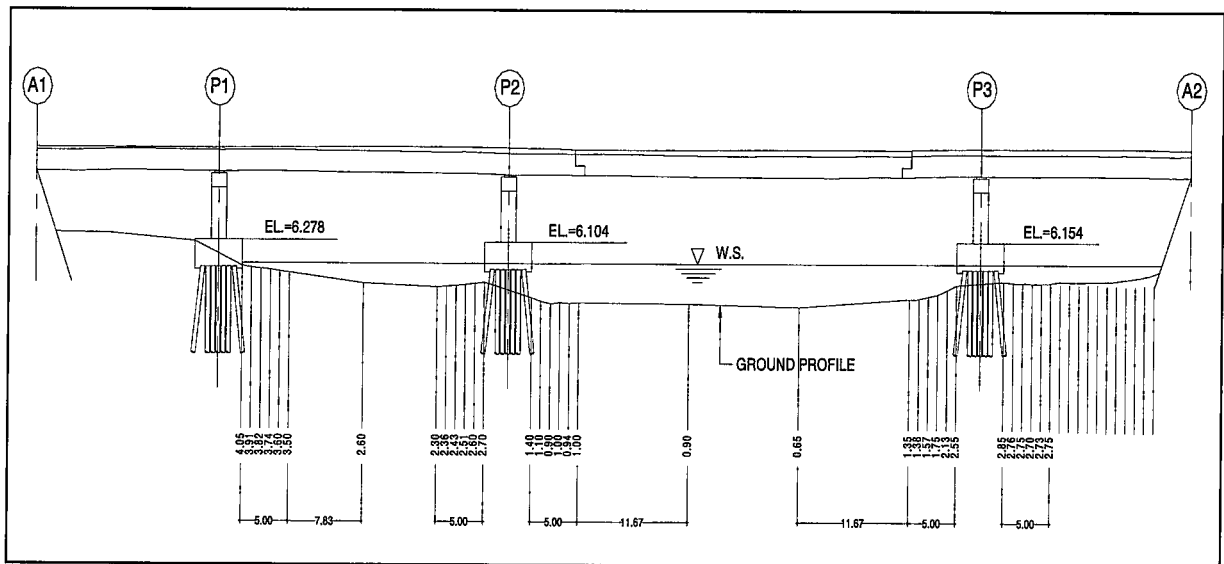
Result of Scour Survey conducted on Vargas Bridge
